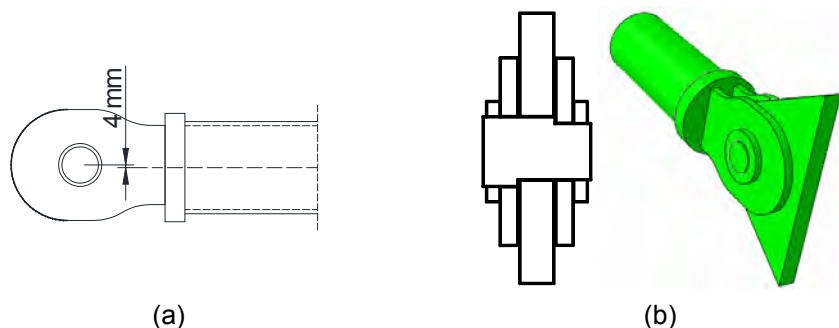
Connection eccentricity (a) and improved connection detailing (b).
